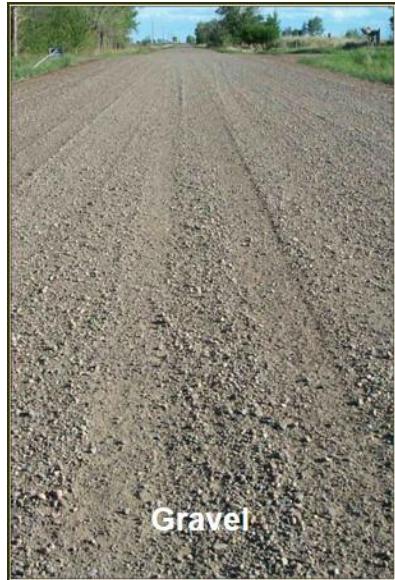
An example of an Unpaved and Gravel Road Surface in the ORN.
